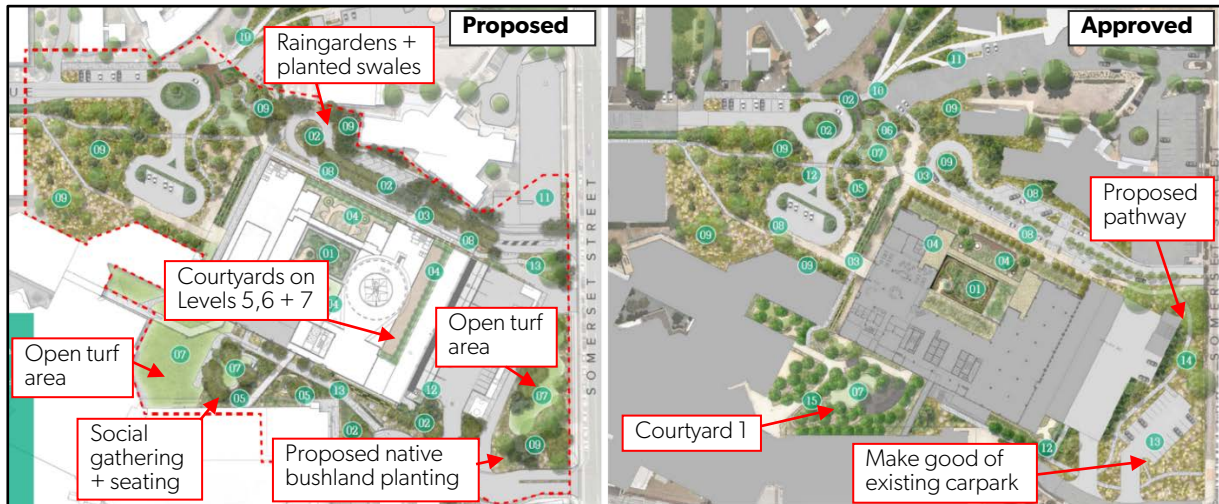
| Proposed (left) and Approved (right) landscape plan (Source: Modification Application)
